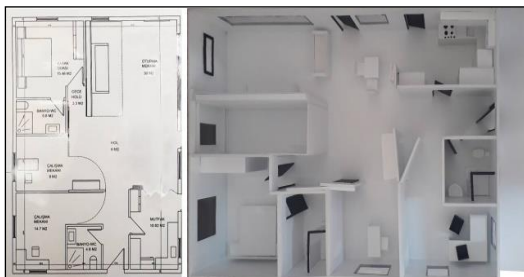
Plan and top view of the example house of Student Group 2 – Flexibility.
